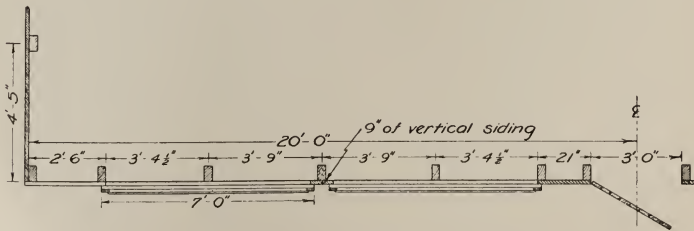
Recommended changes in the front wall framing and changes in the location of the curtains when only one front door is desired in each 40-foot unit.
